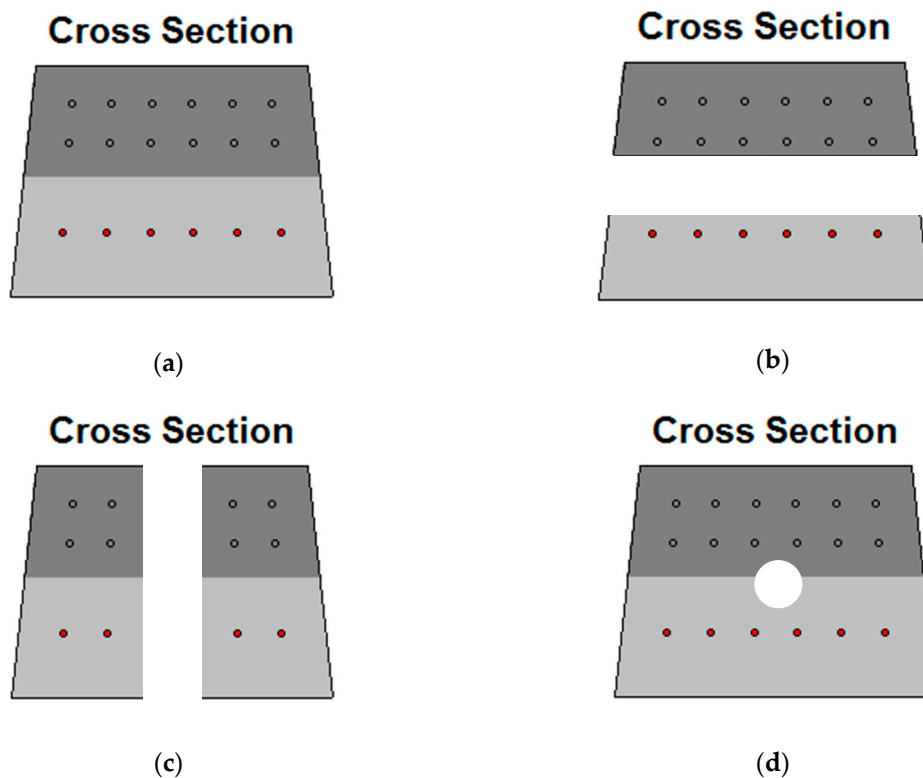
Web opening and holes in cross-ties in practice: (a) Full cross section of a traditional standard-gauge railway concrete cross-tie; (b) Web Opening (or transverse hole); (c) Vertical hole; (d) Longitudinal or through hole. These holes are often installed after construction to accommodate various needs such as cables, additional bolts, bracing system, lateral or third rail fixtures, etc. The position of the hole is often at the middle between the edge of rail and the sleeper end (with reduction to about the half of maximum shear force action). No steel reinforcement has been damaged from these holes and web opening.
